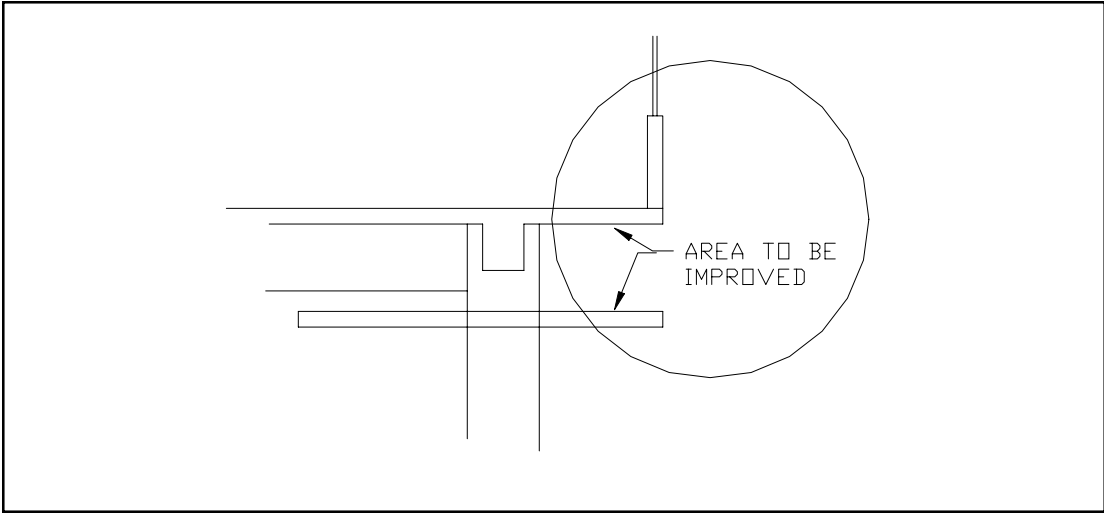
Existing Arrangement in Front Cantilevered Portion
